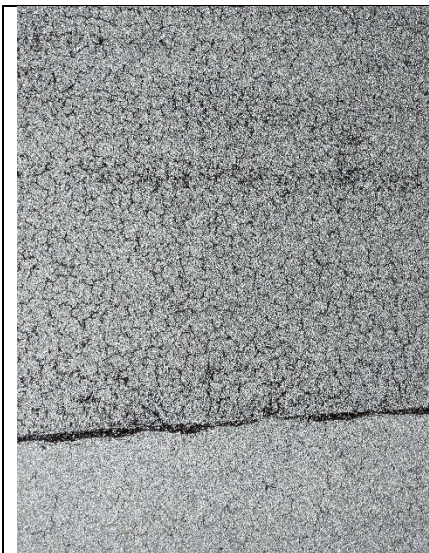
Alligatoring (cracking) of roofing membrane.
